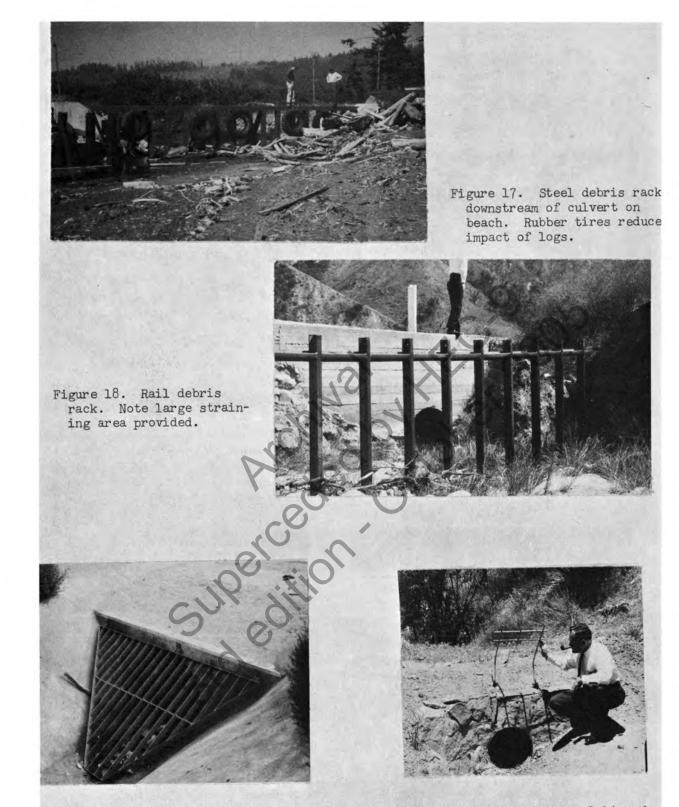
Hinged steel debris rack in urban area. Due to nature of debris and possible entry by children, bar spacing is close. Figure 20. Debris control hinged installation of reinforcing steel at inlet to roadside downdrain.
